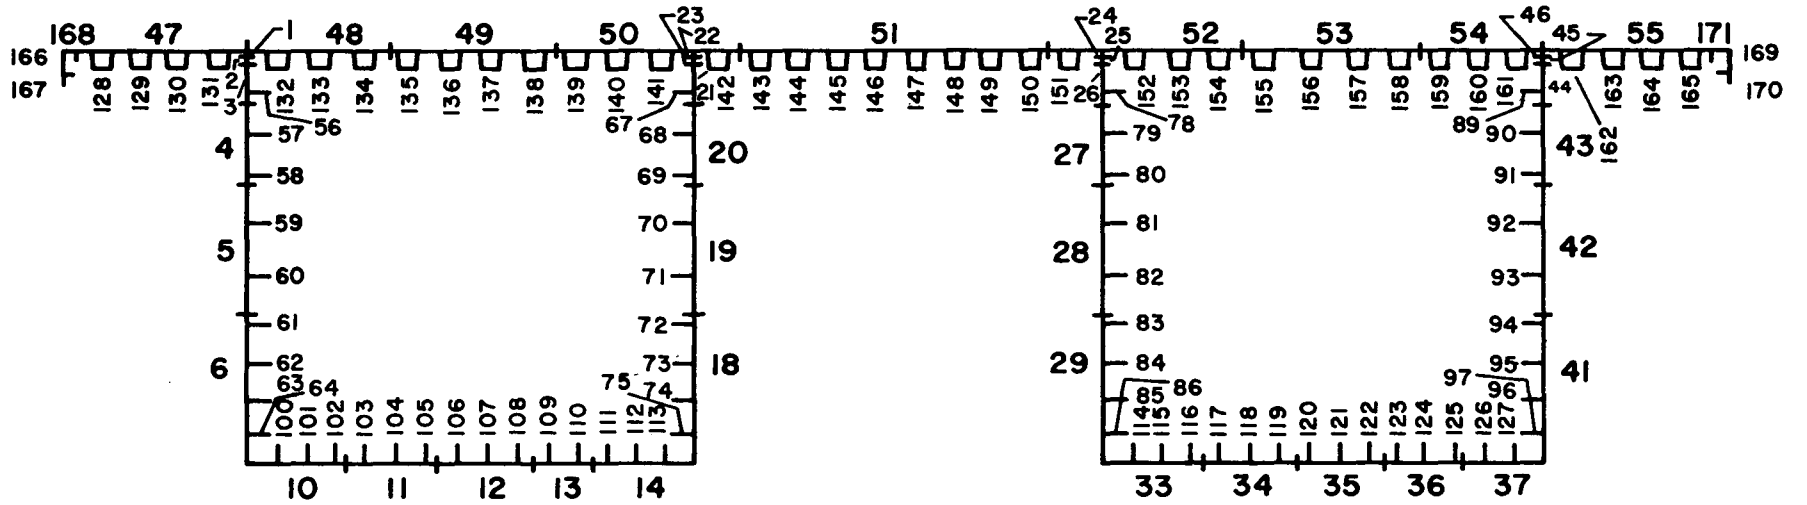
Subdivision of Section at FB27 into Elements.
